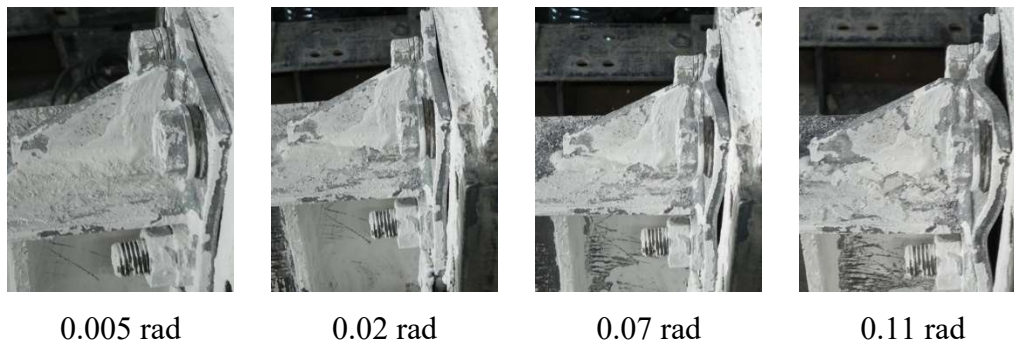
Deformation patterns of a stiffened end-plate (Specimen 10)
